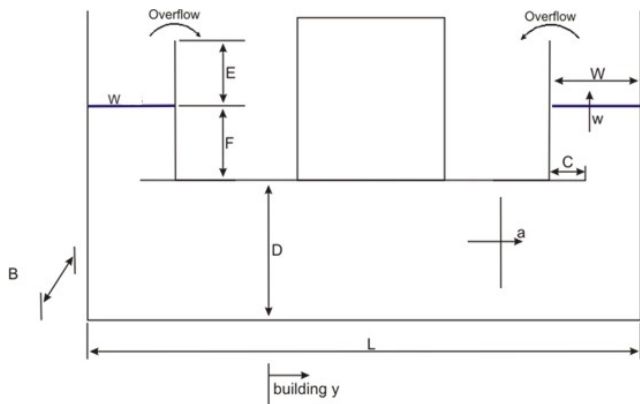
Definition of Damper Tank Parameters on an Elevation View of a Liquid Tuned Mass Damper
